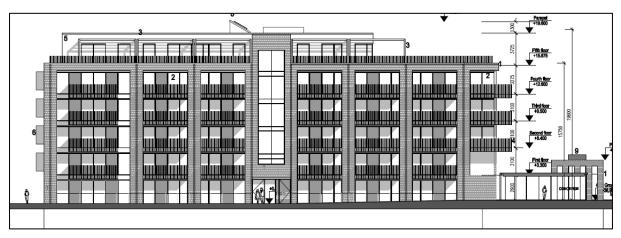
Block A1 West Elevation Glazing to Wall Ratio
